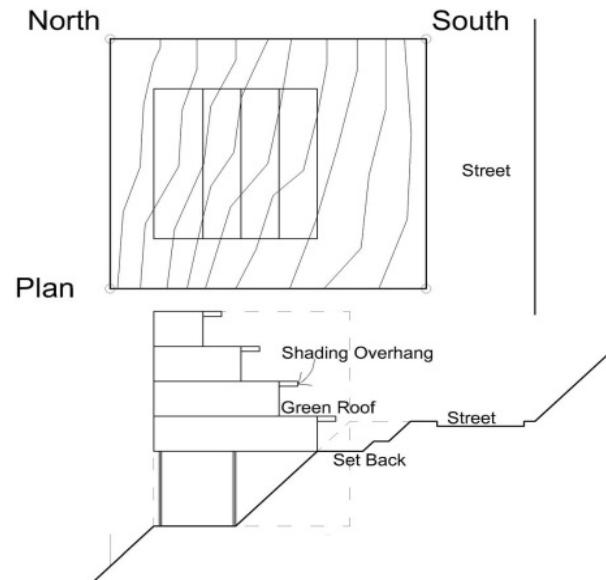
Suggested apartment buildings layout on a north facing slope.
